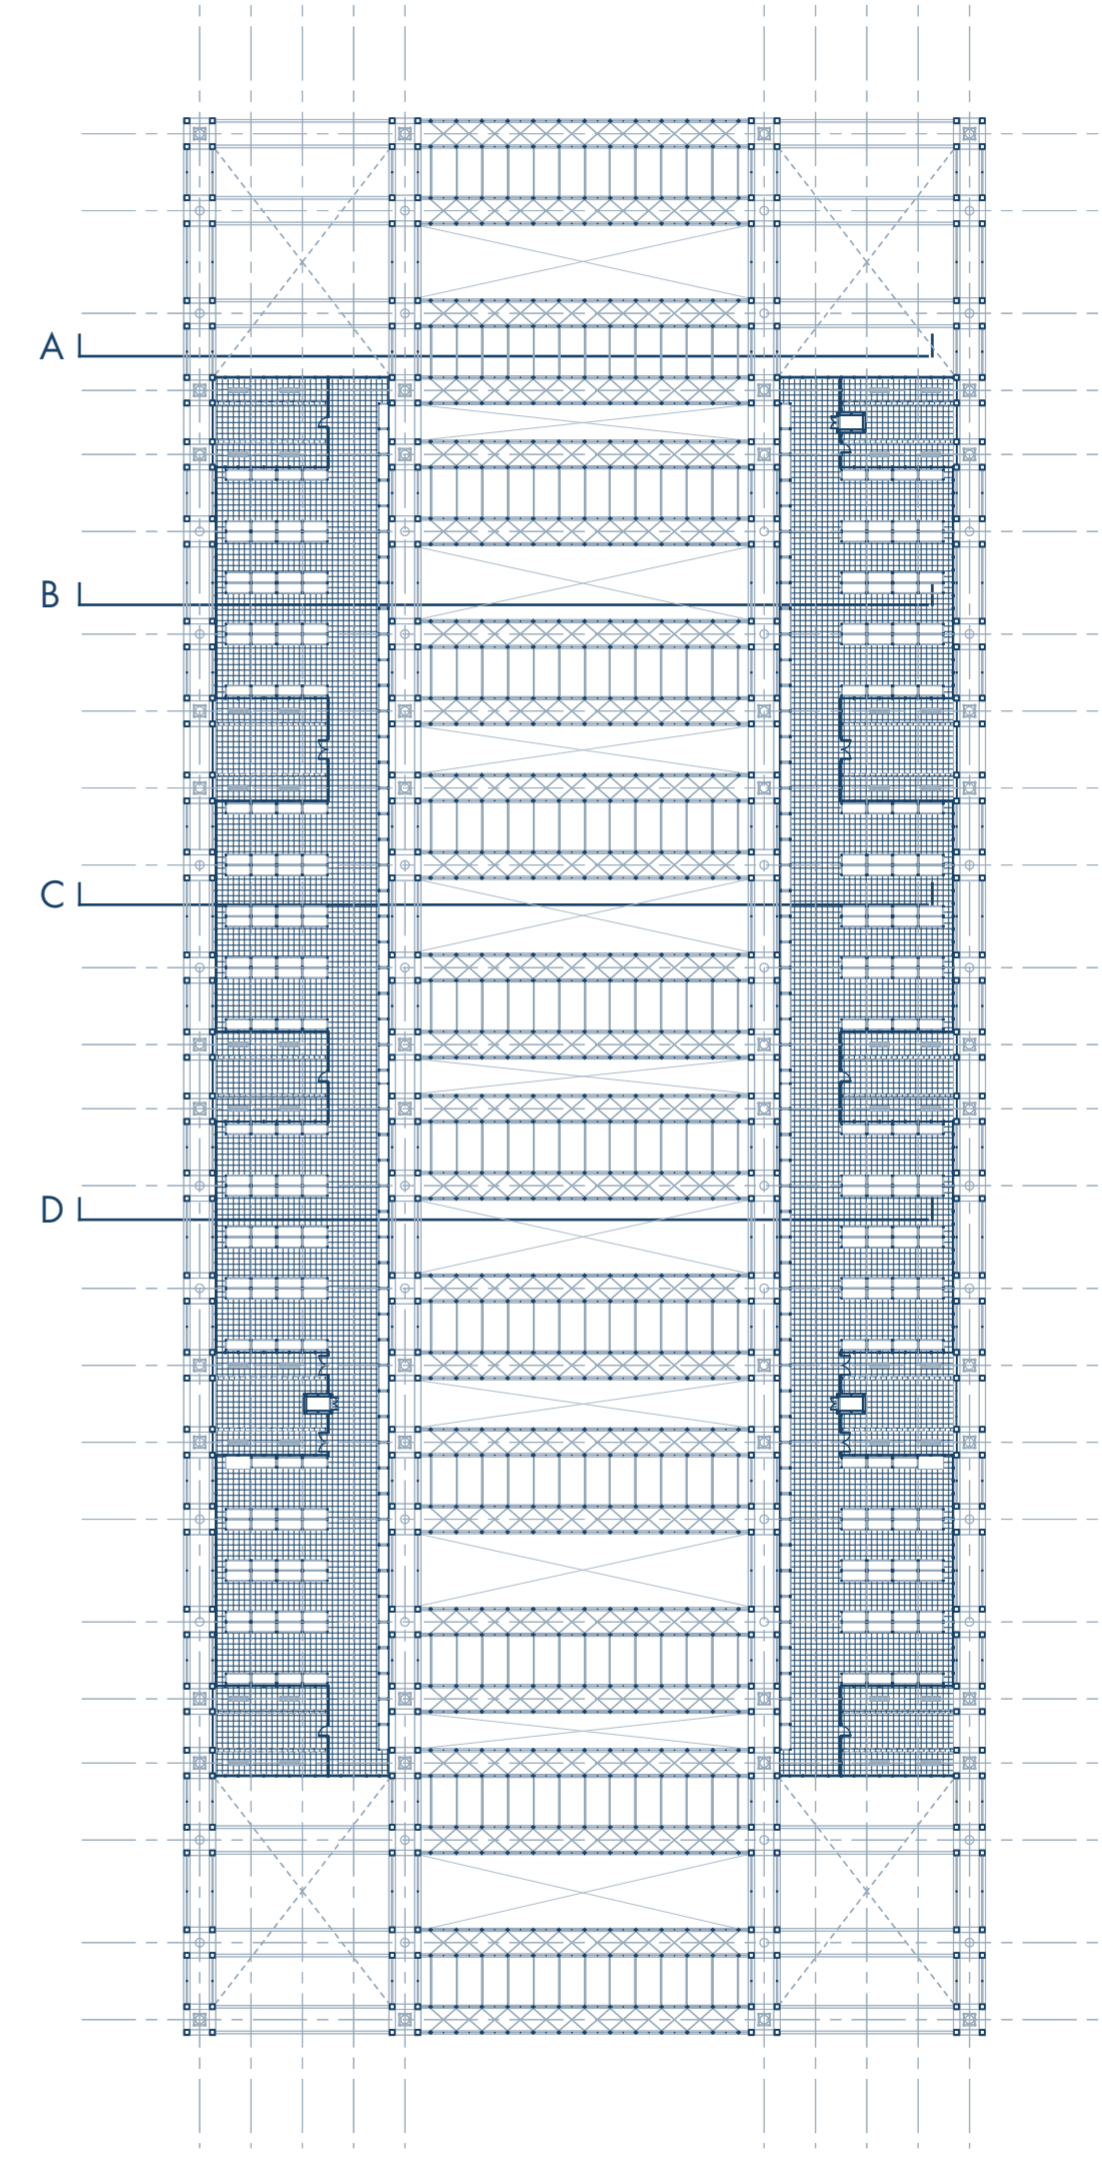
Finalized institutional First floor plan. (Drawing by author, 2026).
